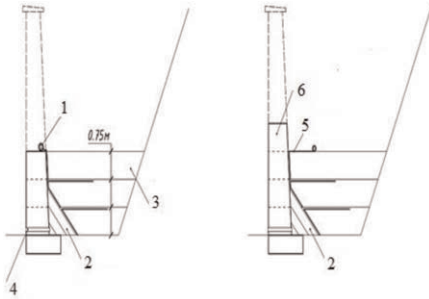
Stages of the landslide protection wall construction from geosynthetic materials: 1- sealing roll (2 m); 2 – drainage prism; 3 – reverse filling of the next layer; 4 – drainage pipe; 5 – unrolling of the sealing roll; 6 – the next work section of rubble masonry.
